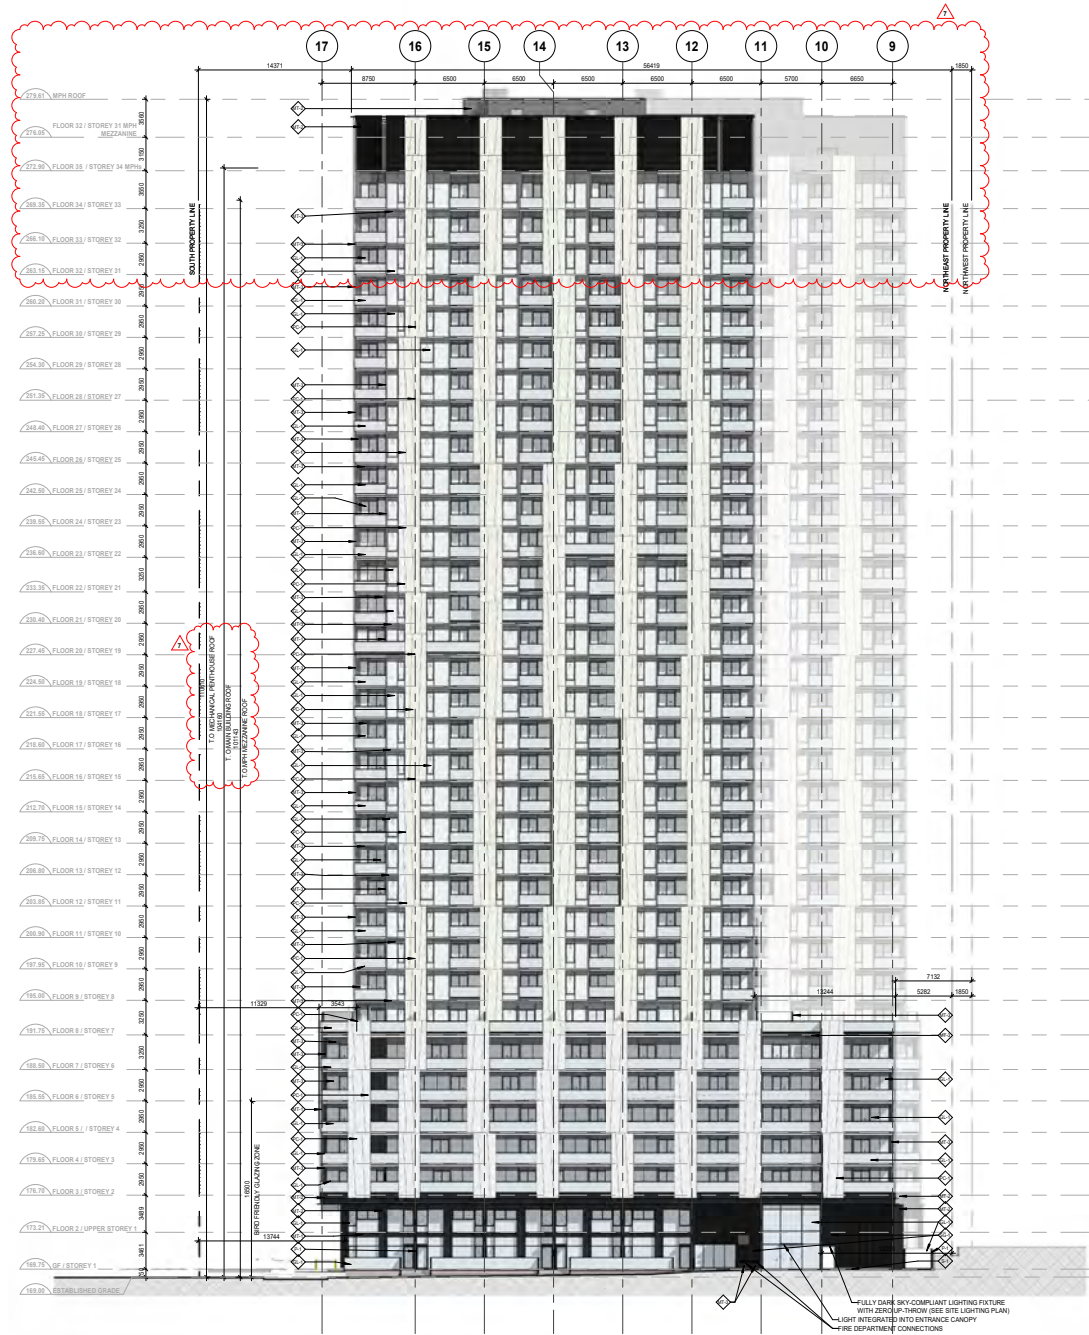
East Elevation by Quadrangle Architects Limited (not to scale)
